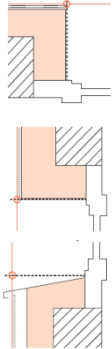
Thermal Envelope and EBF of Villa B – basement, ground floor, first floor and attic
